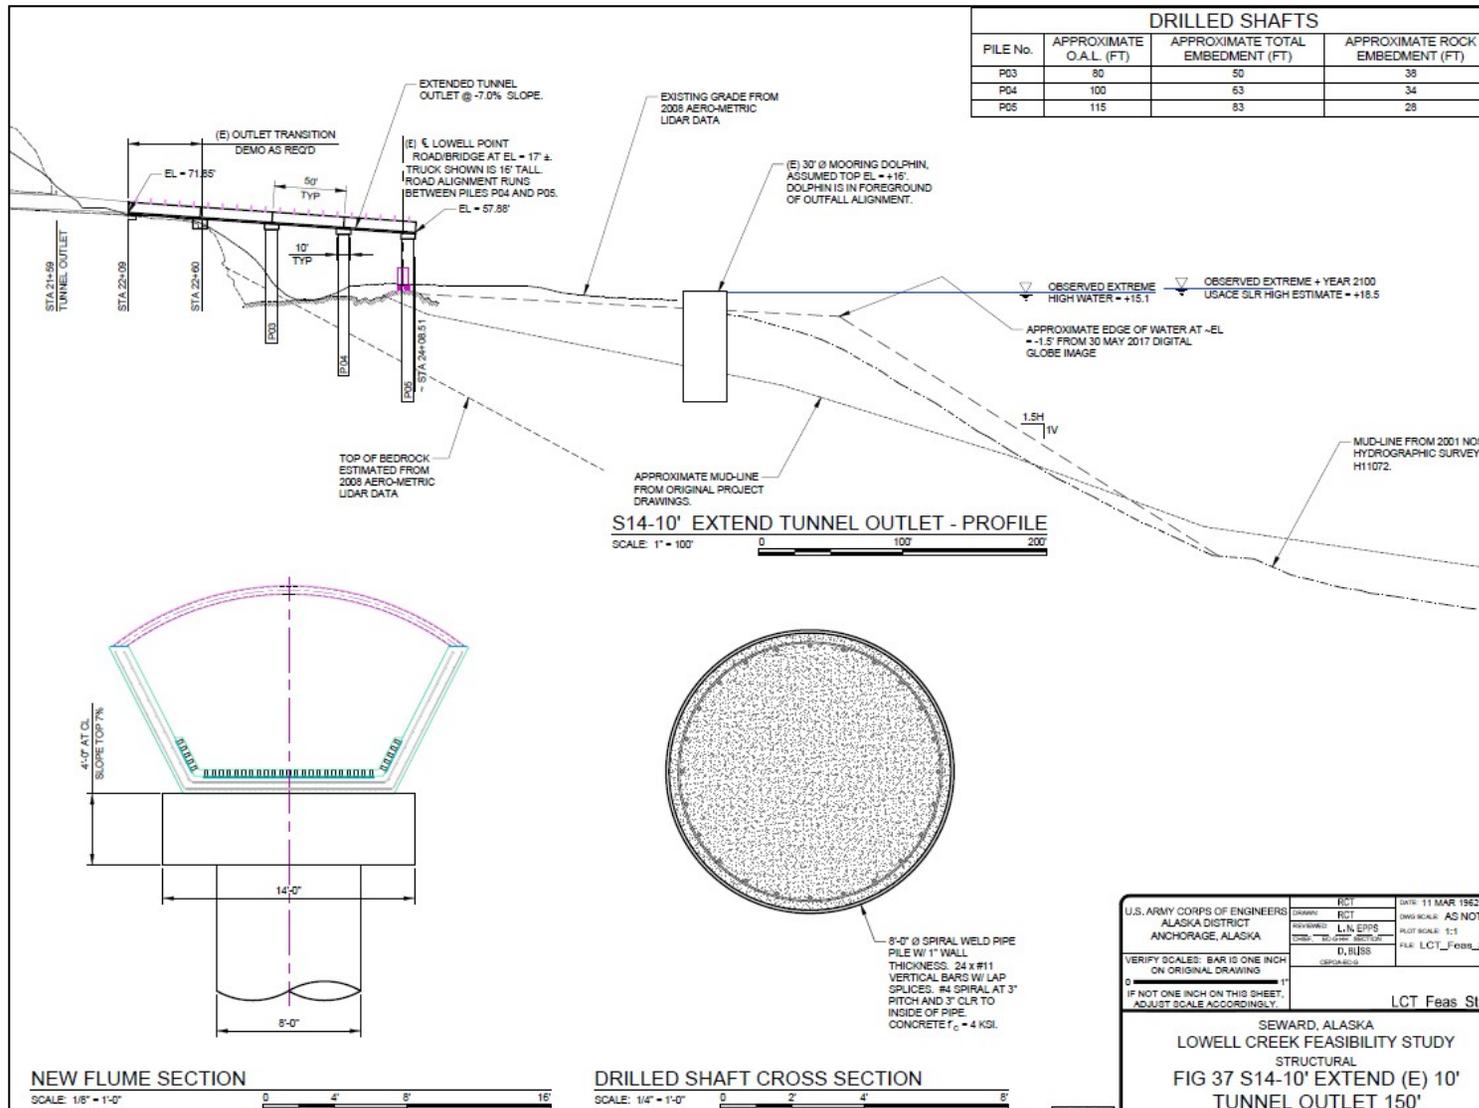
Extend Existing 10' Tunnel Outlet 150' to Shelter Road (Alternative 2)
